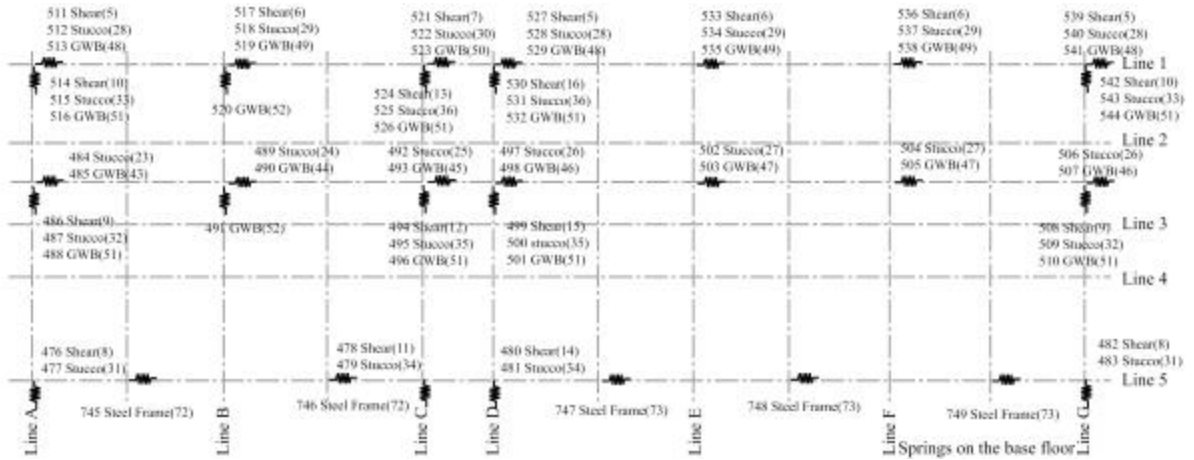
Locations, Orientation and Numbering of Shear Elements for retrofit measure No.8 of Apartment Index Building.
